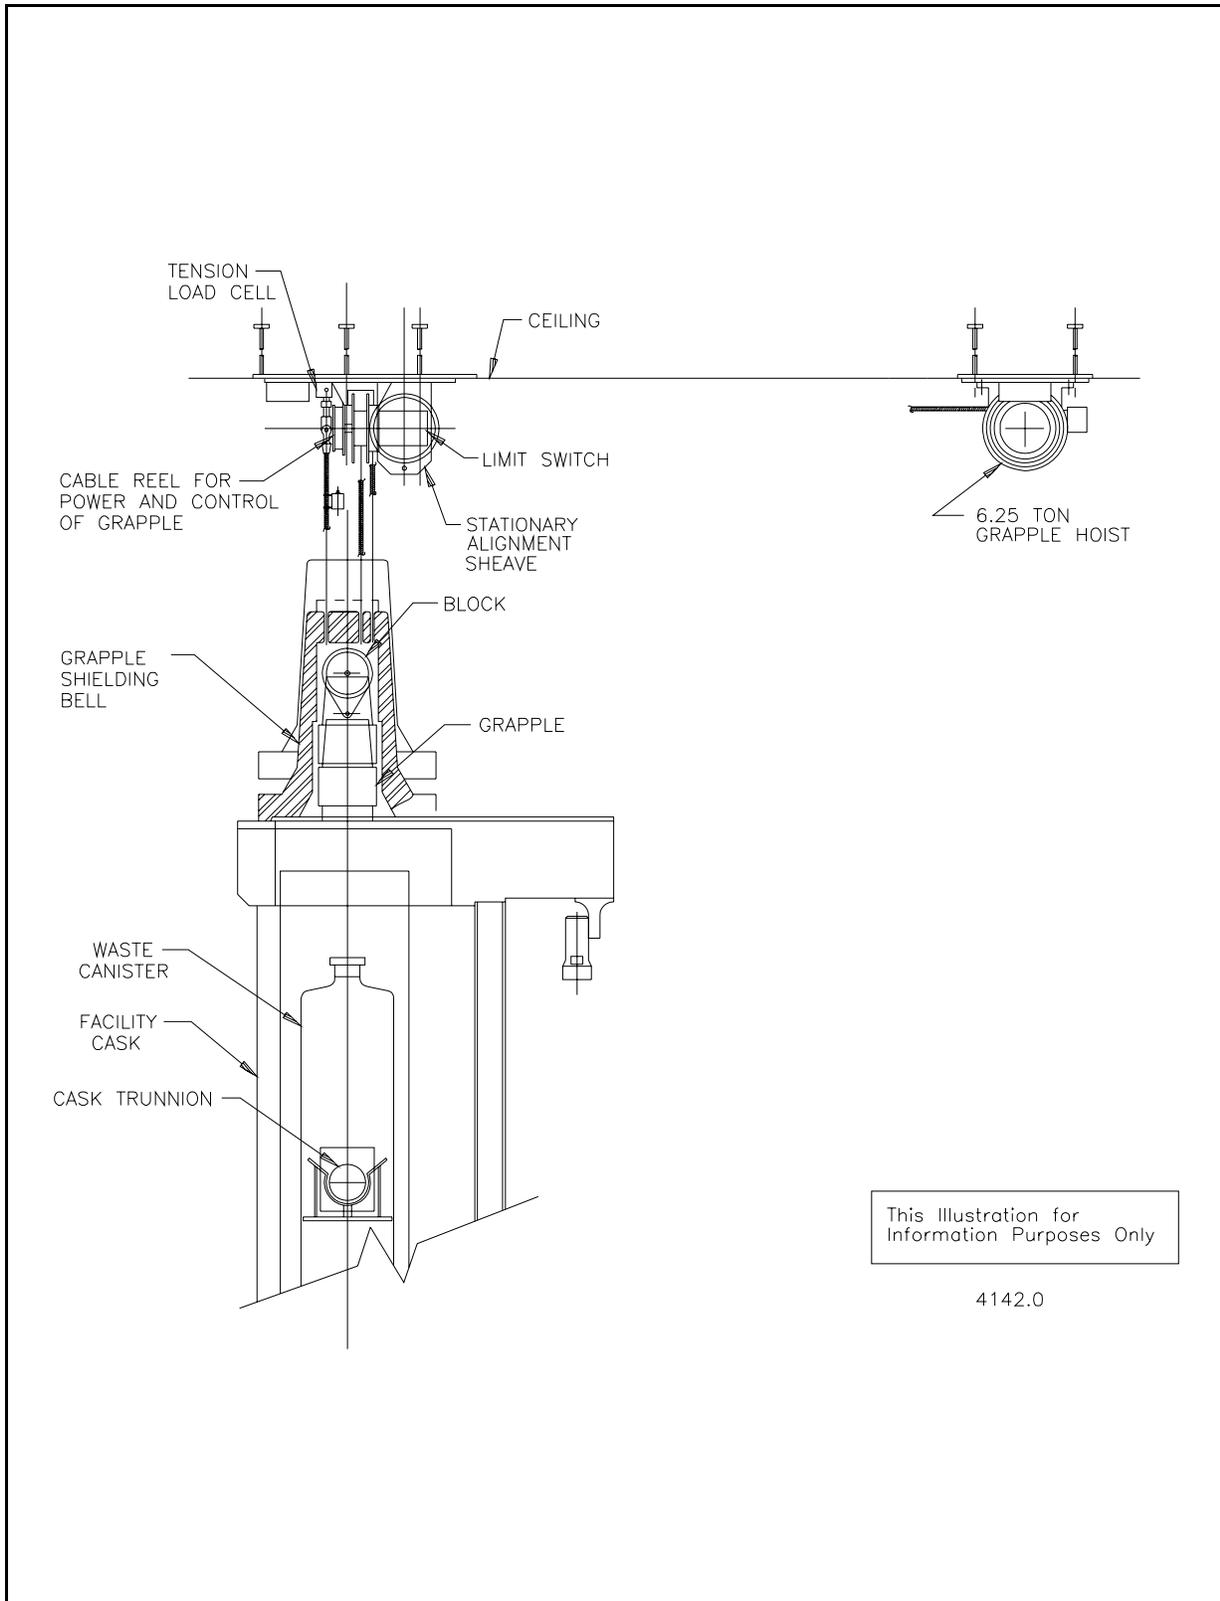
, 6.25-Ton Facility Cask Loading Room Grapple Hoist
